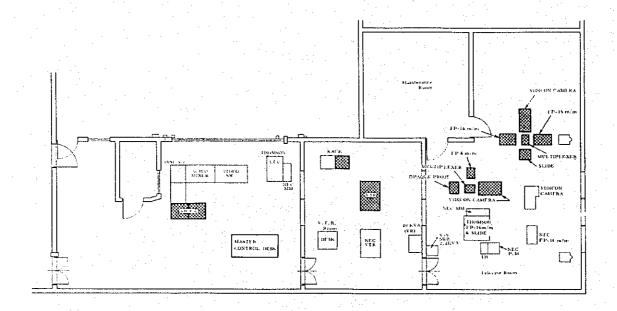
Improvement of New T.V Studio Building 2nd F
